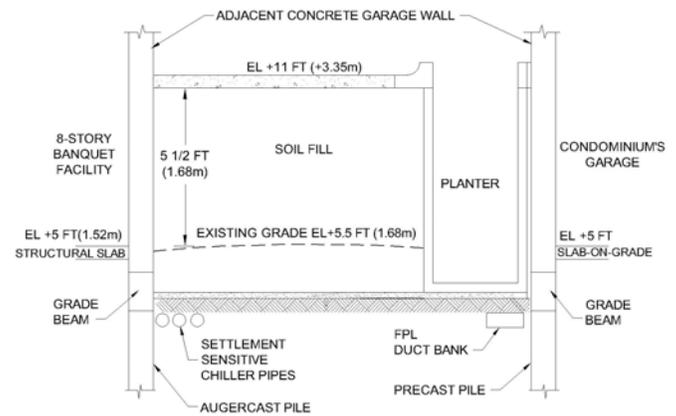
EXISTING CONDITIONS & PROPOSED SOIL EMBANKMENT (CROSS-SECTION)
